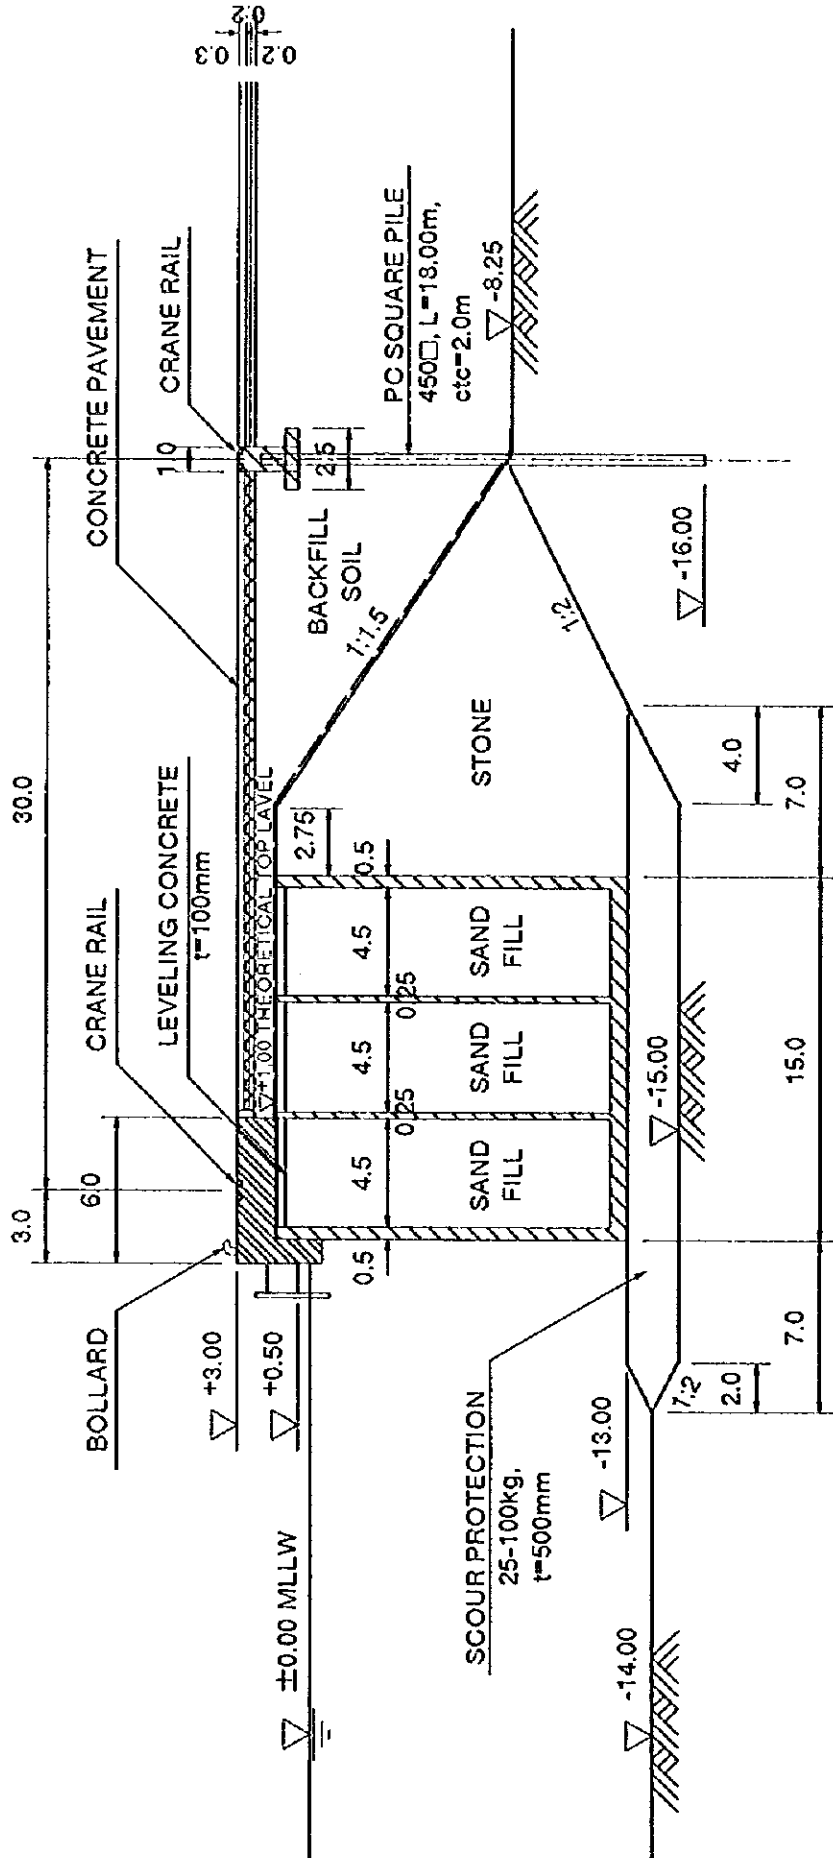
Typical Section of Main Quay at Cubi Pt. (Alternative 3)
